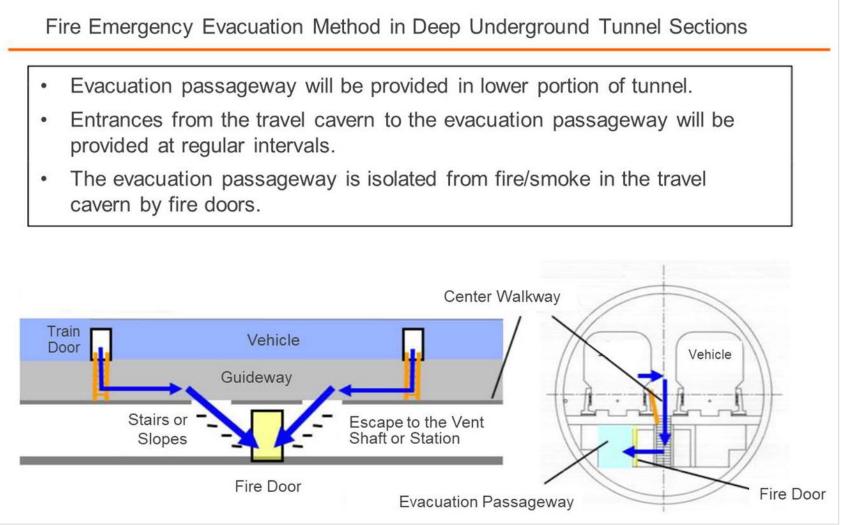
Conceptual Typical Section of SCMAGLEV Tunnel Illustrating Emergency Stairs to Escape Gallery
